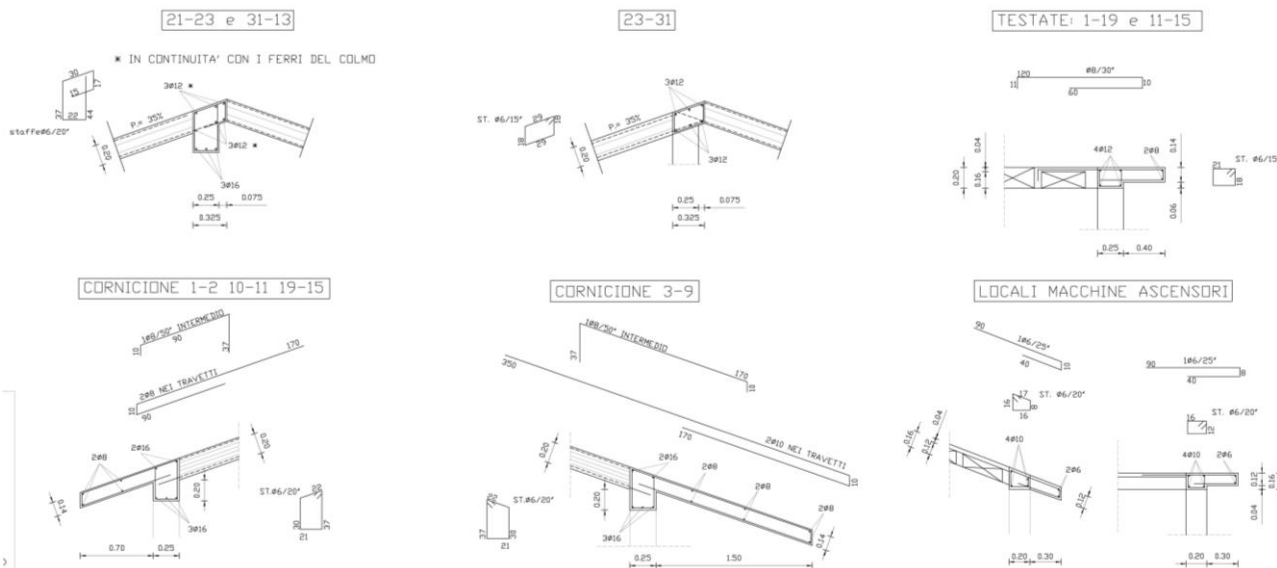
Technical drawings of the details of some RC beams on the roof – Source: [151]
